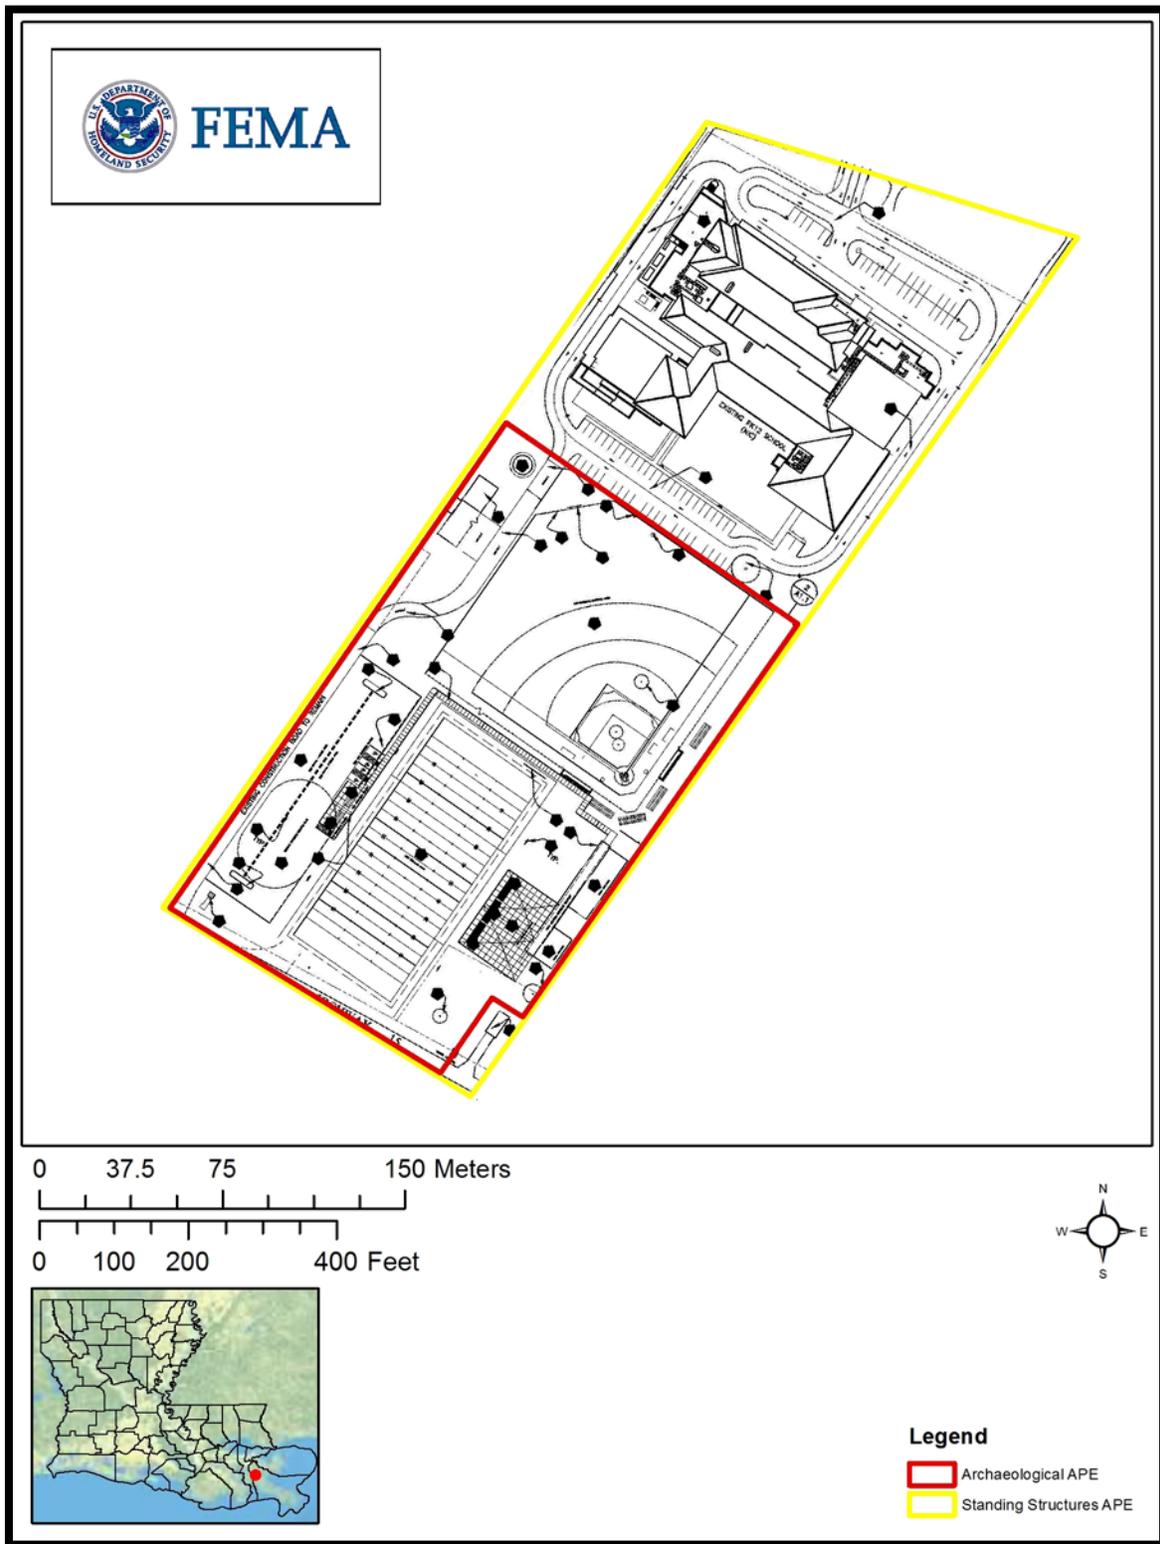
Excerpt from Partial Site Plan dated 06/20/2014, submitted to FEMA on 09/17/2014, Phoenix High School Site Enhancements, 12700 Hwy. 39, Braithwaite, LA depicting APEs.
